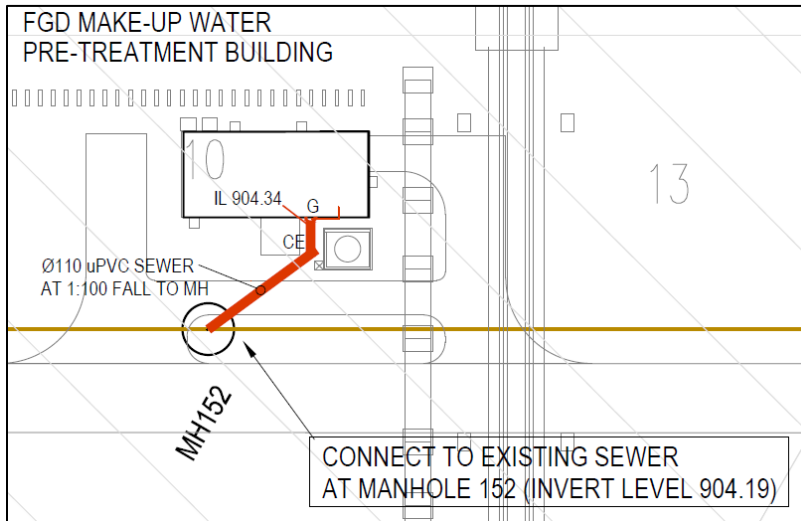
Layout plan for sewage network for the FGD Make-up Water Pre-treatment Building
